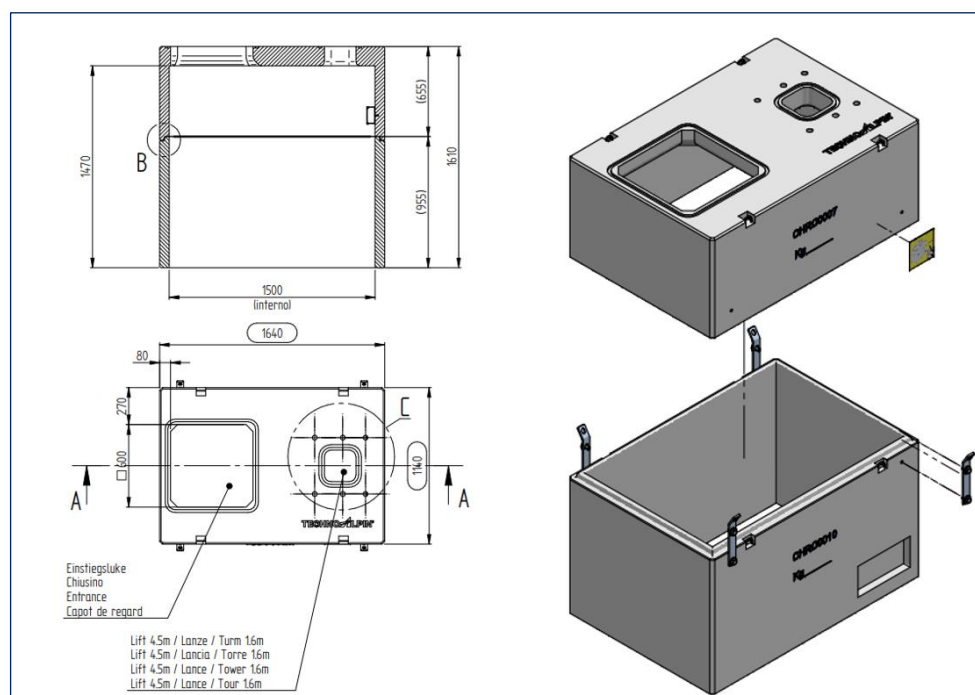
| Universal concrete pit dimensions and image (Source: Applicant's documentation)
